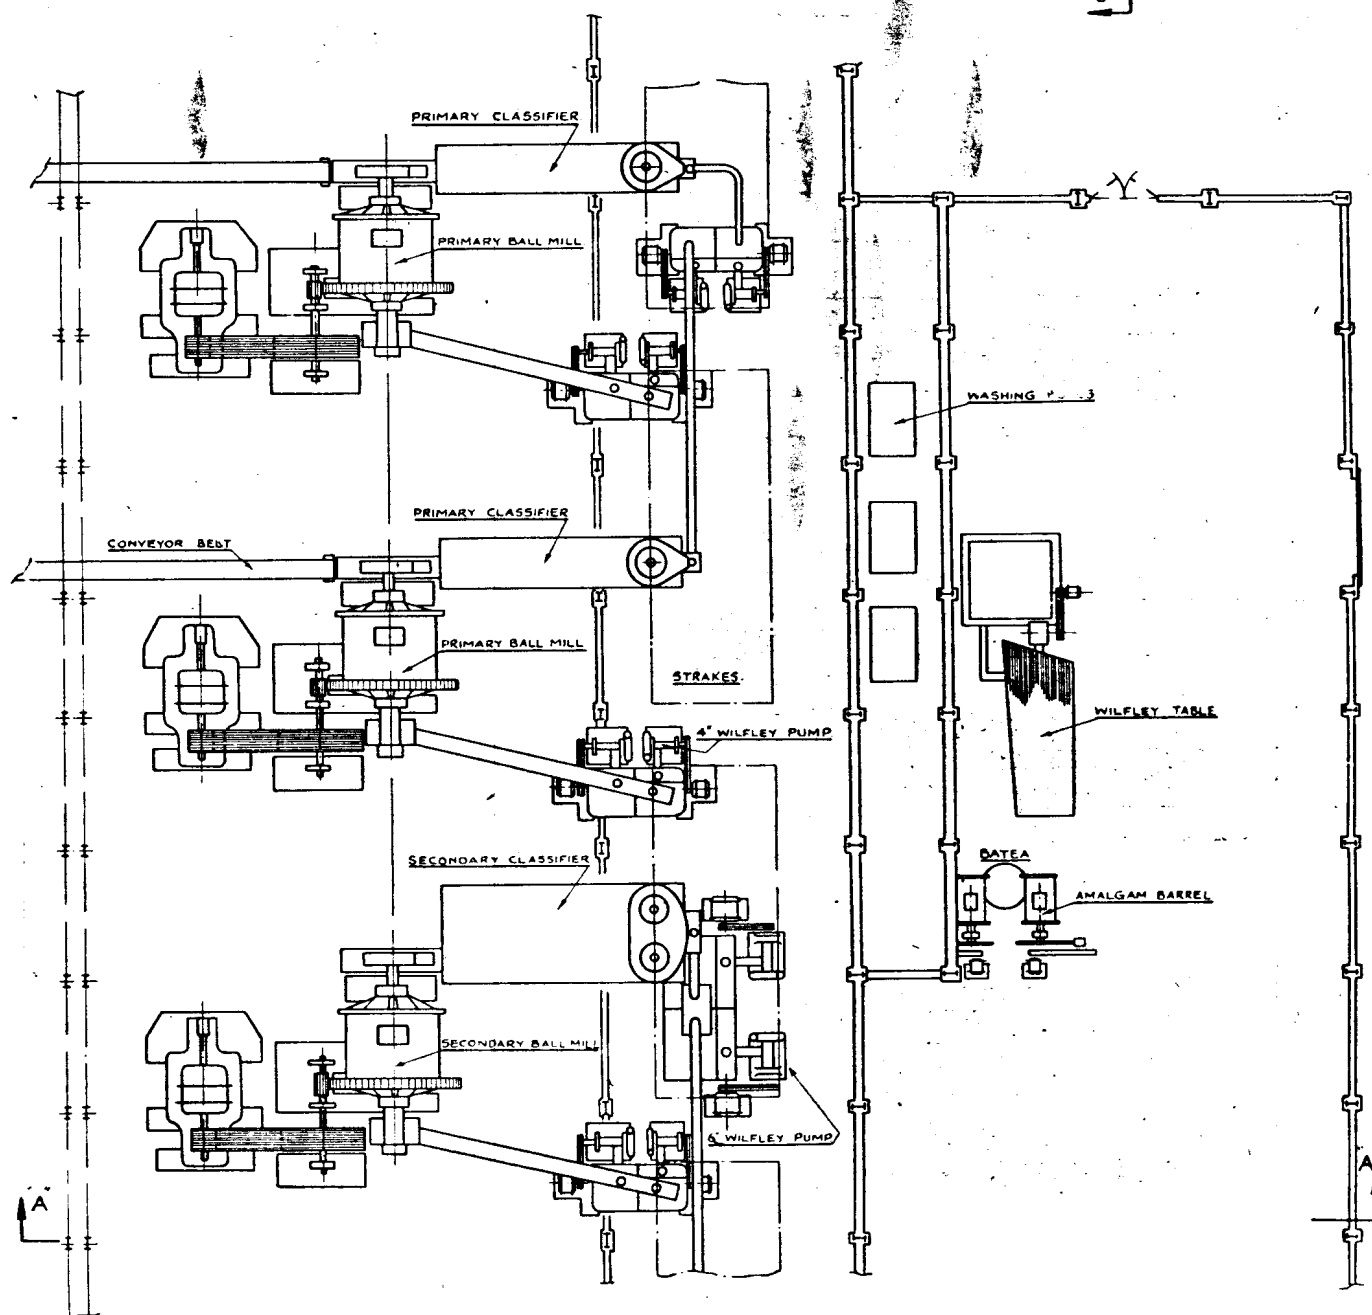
ORIGINAL MILLING AND STRAKE INSTALLATION—SECTION AND PART PLAN
